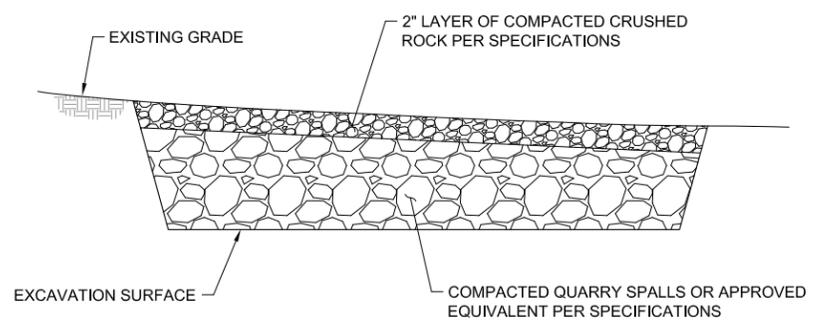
Phase 4A and RA-11 Soil Remedial Excavation Plan
